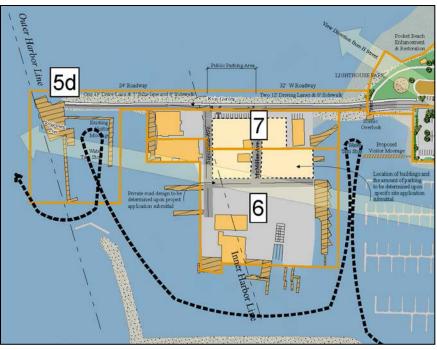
Planning Area 7 – Dakota Commons Conceptual Plan
